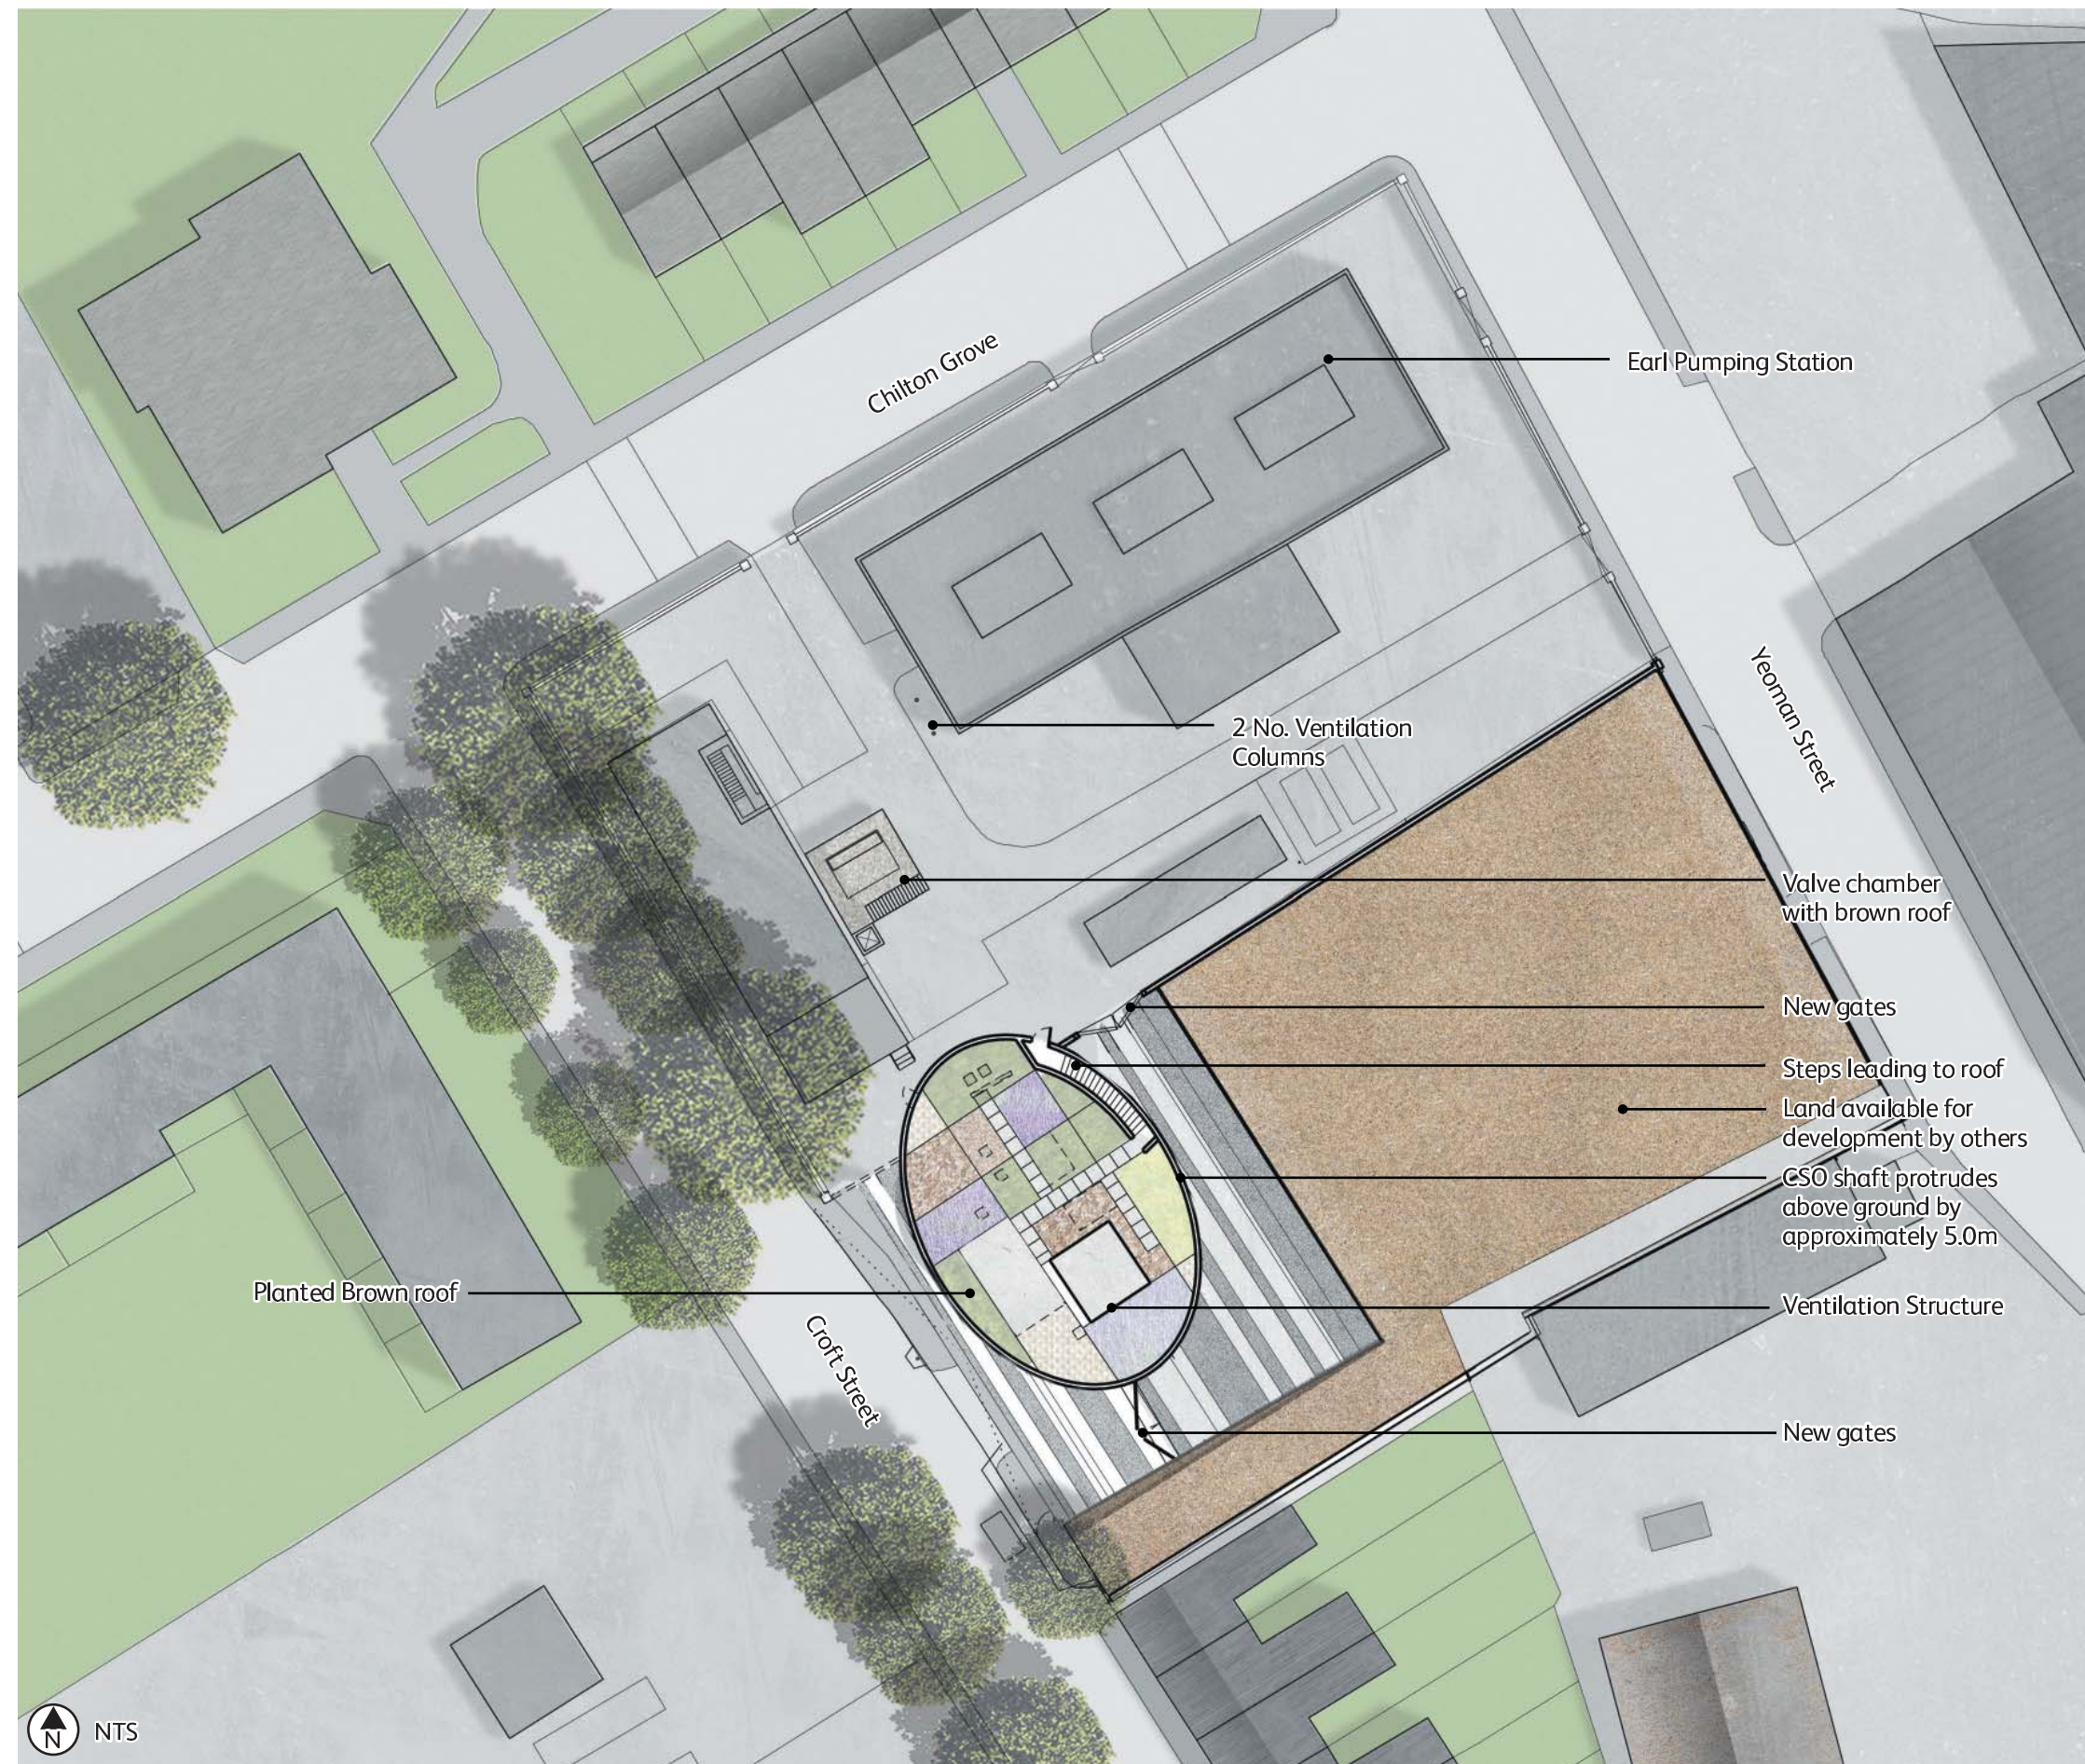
wPermanent works layout - refer to Permanent works layout in the Book of Plans
